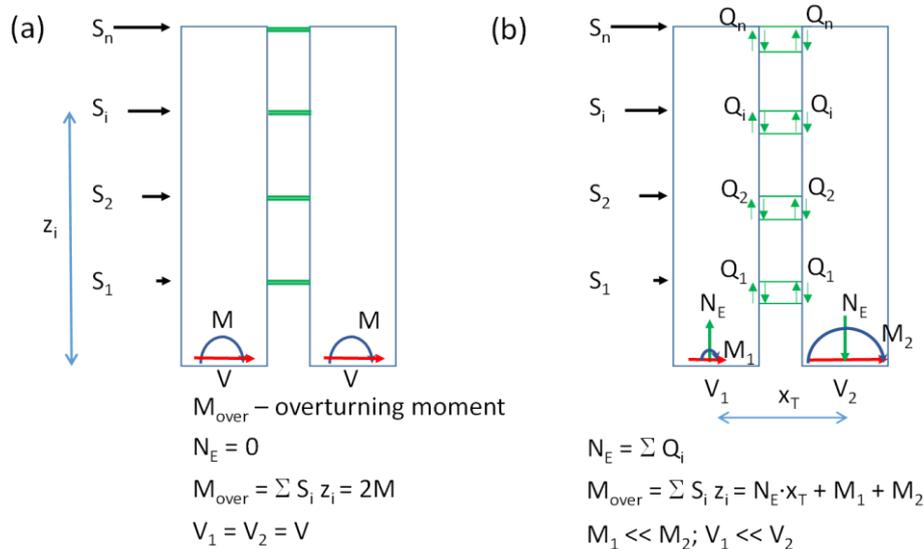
Resisting mechanisms: a) cantilever walls (very weak coupling), b) coupled walls (significant coupling of wall piers)
